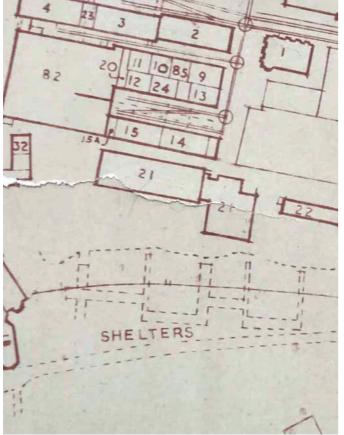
Detail of undated Block Plan showing the original configuration of the Air Raid Shelters Norfolk Record Office
